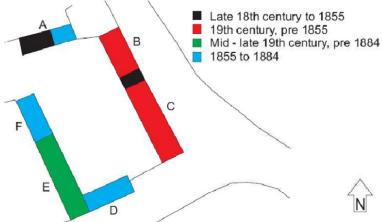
Phasing plans plan of buildings Application reference 07/02176/LBC.
